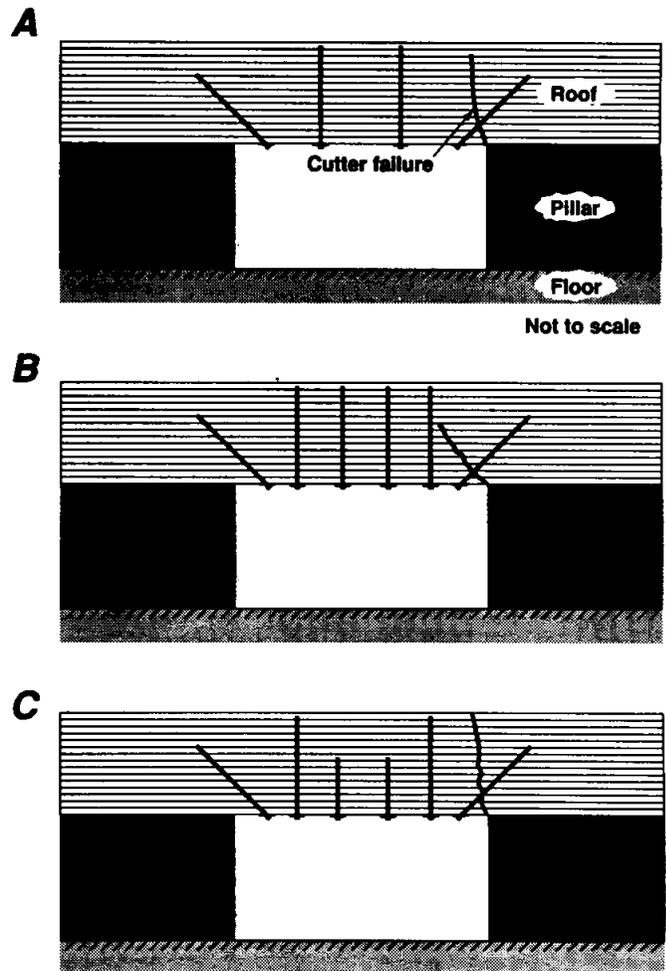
Examples of cutter roof support with angle bolts. A, Bolts anchored in roof above pillar for near vertical cutter failure plane; B, bolts installed at 90° from cutter failure plane; C, angle bolts used in conjunction with staggered-length bolts.
